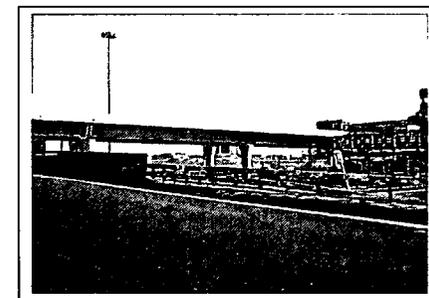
Typical Box Beam Guiderail Transition to Concrete Barrier
